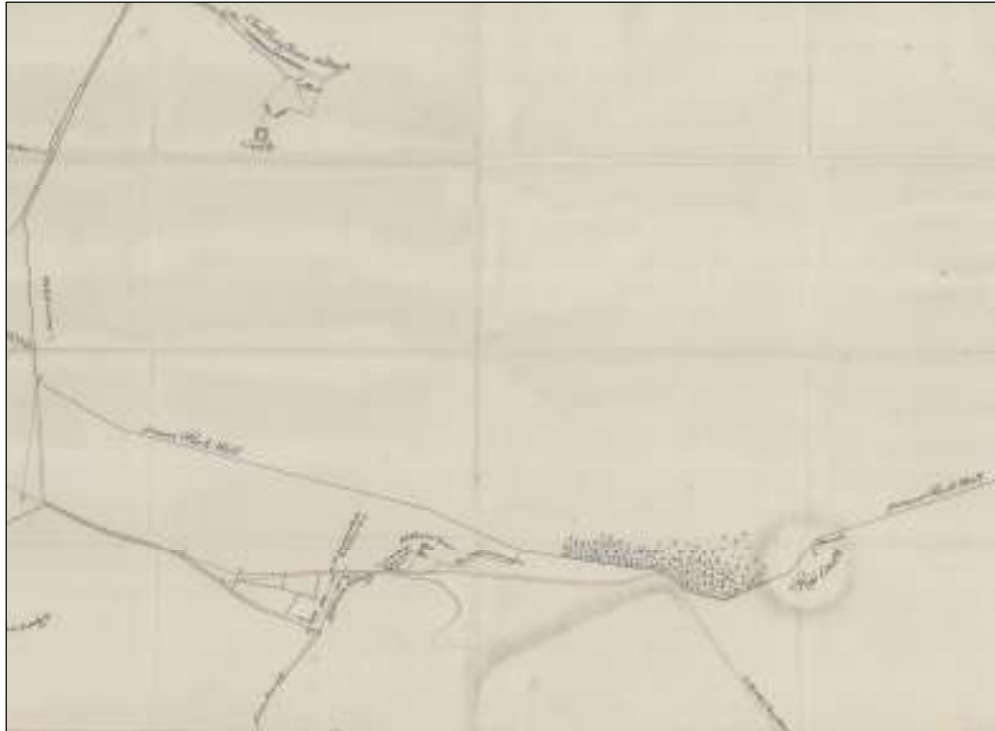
Eighteenth century plan of proposed extension to southern boundary wall. New line of wall is marked in red
